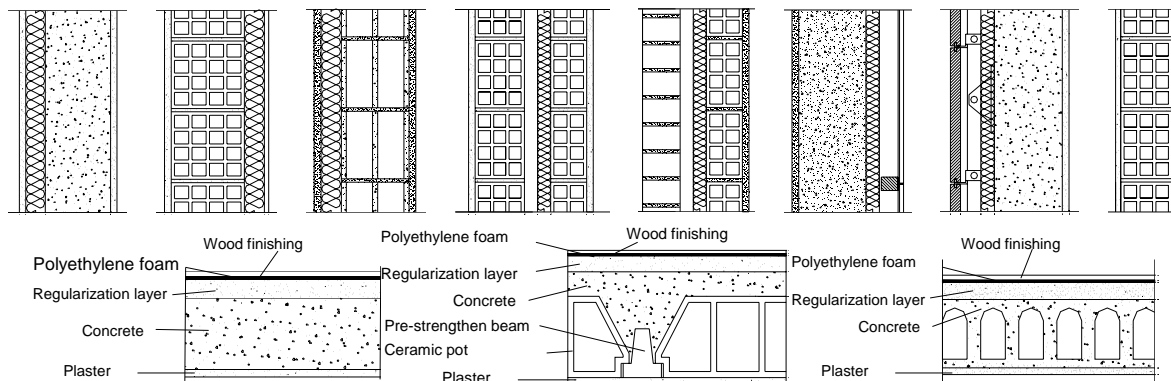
Vertical cross-section of the construction solutions of the walls and floors (external and partition elements)
